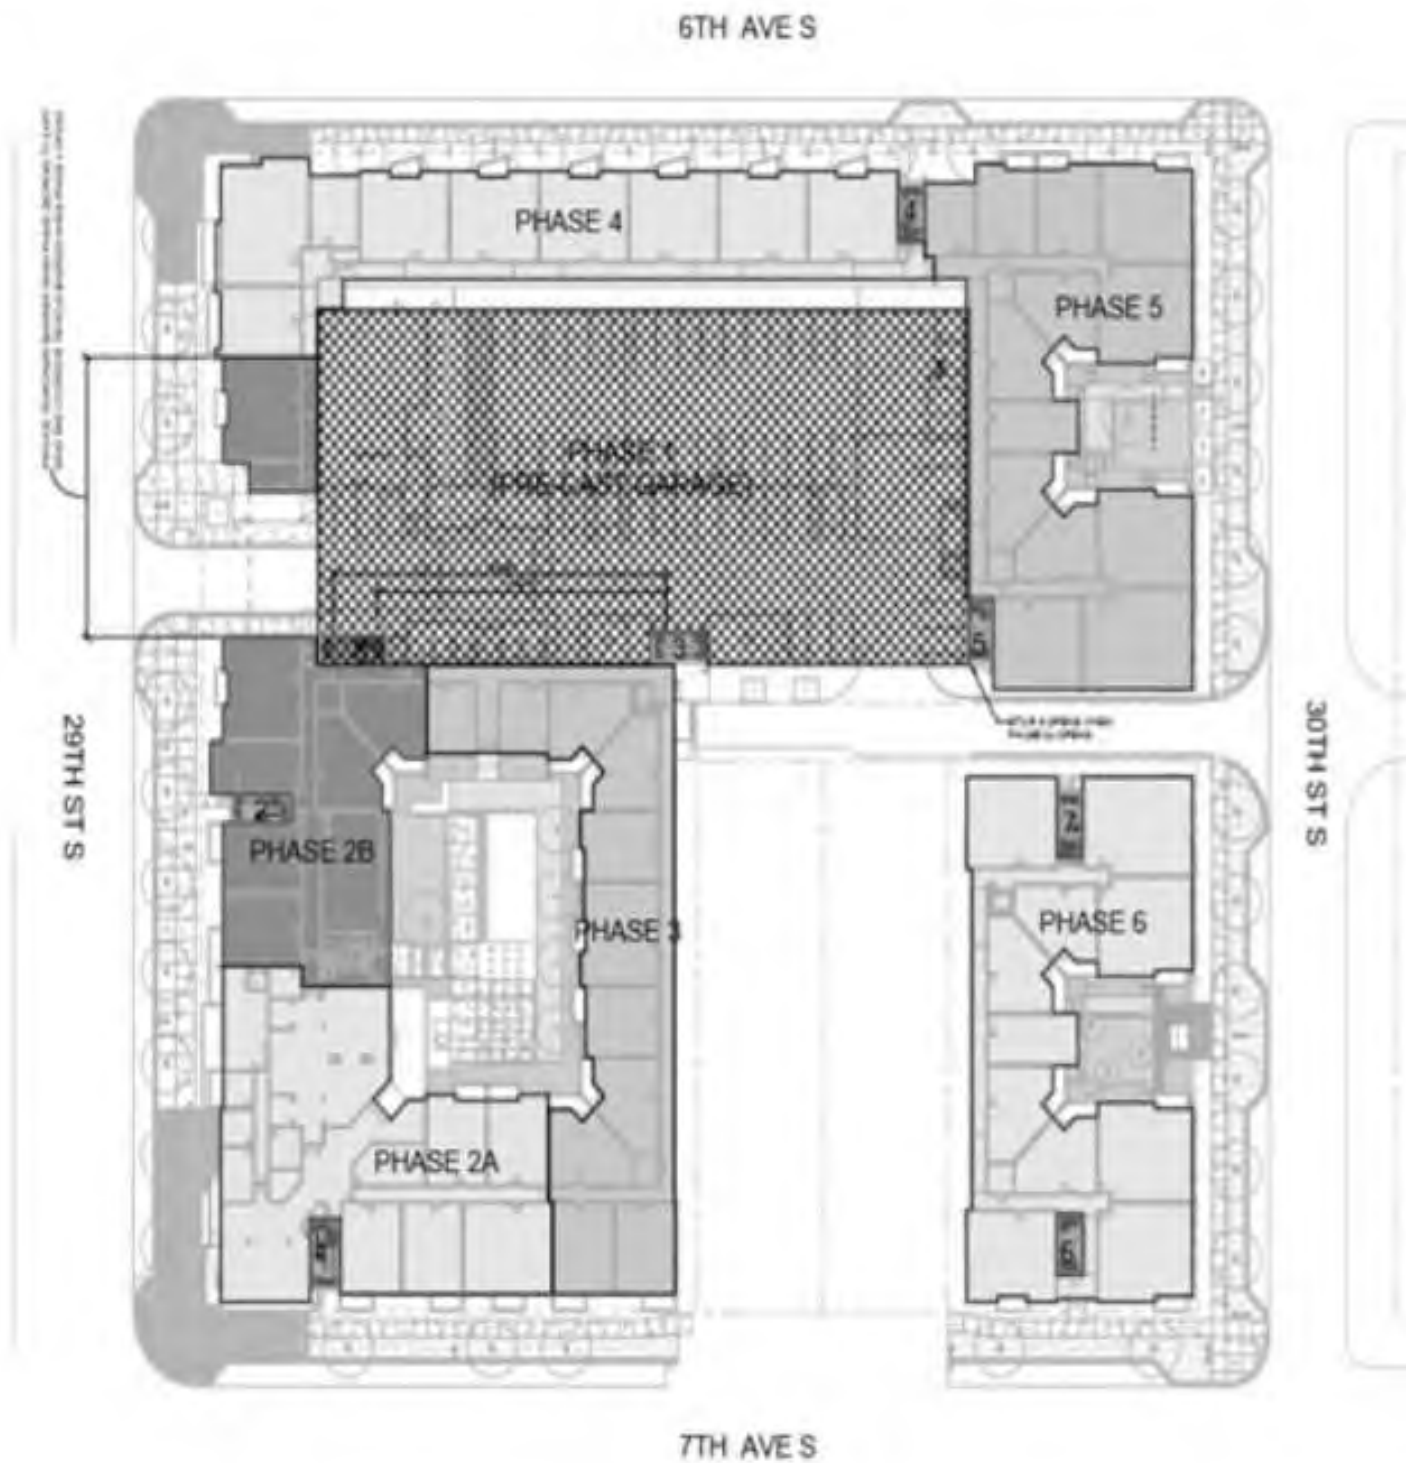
Floor plan for 2nd floor of the Metropolitan. From R. Schroeder.
